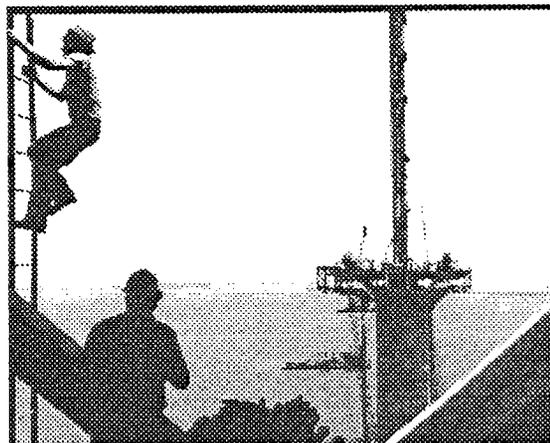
Construction on the southern main span pier from an added segment on the north main pier.
